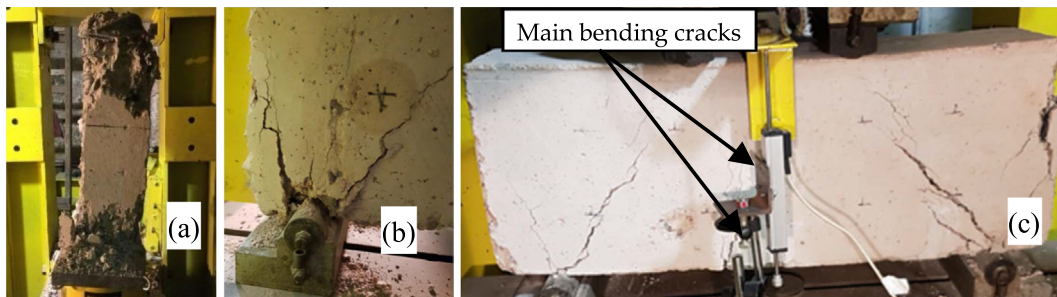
Observed failure modes: (a) Compression failure of burned reinforce concrete column: loss and crumbling of concrete cover, while the confined concrete core remains relatively undamaged; (b) shear-bending failure of burned concrete beam: the shear and crushing failure at the supports become more significant as the duration of exposure to fire increases. (c) main flexural cracks at the center of the beam are less important in beams with duration of fire exposure increase due to that the crushing and shear failures occur first.
